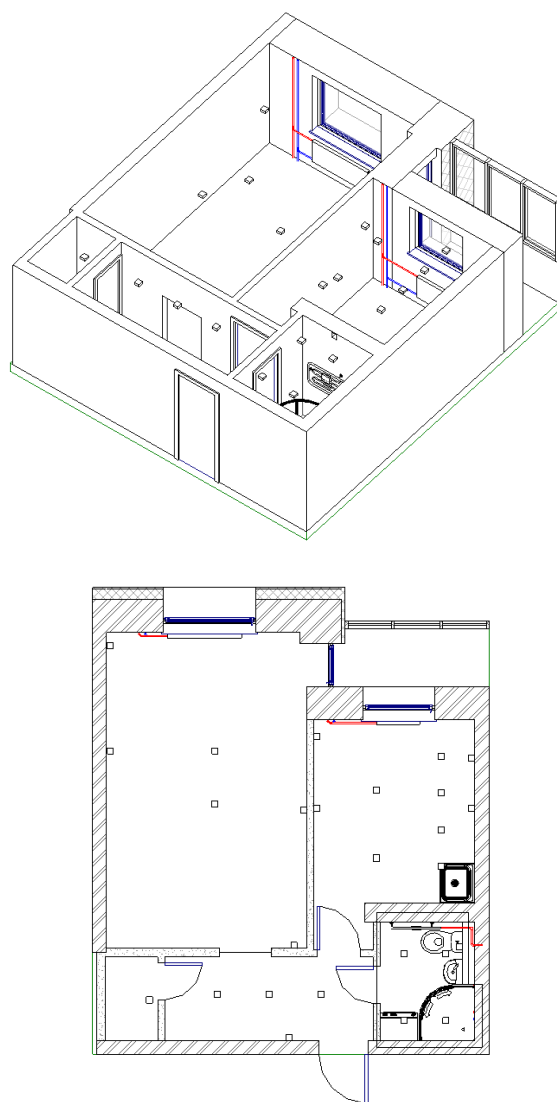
3D view (left) and plan view (right) of the sample apartment
